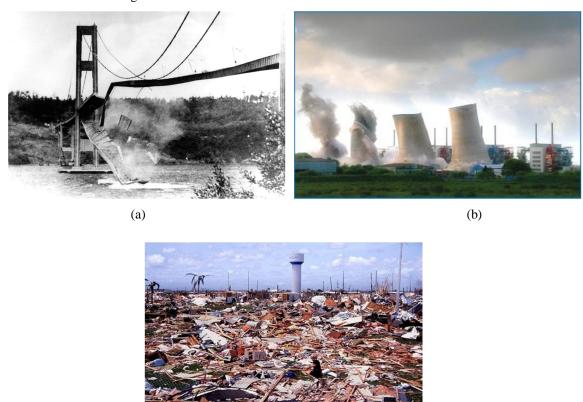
Wind Damaged Structures: (a) Tacoma Narrow Bridge collapse [6] (b) Ferrybridge Cooling Tower collapse [7] (c) Florida after Hurricane Andrew [8].
